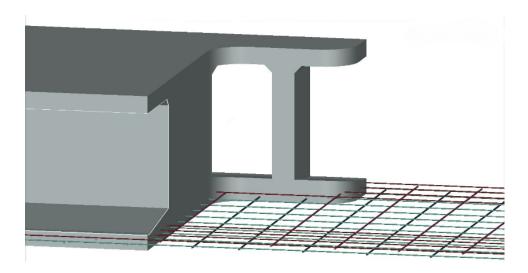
Integral Bent Cap Bottom Slab Reinforcement
